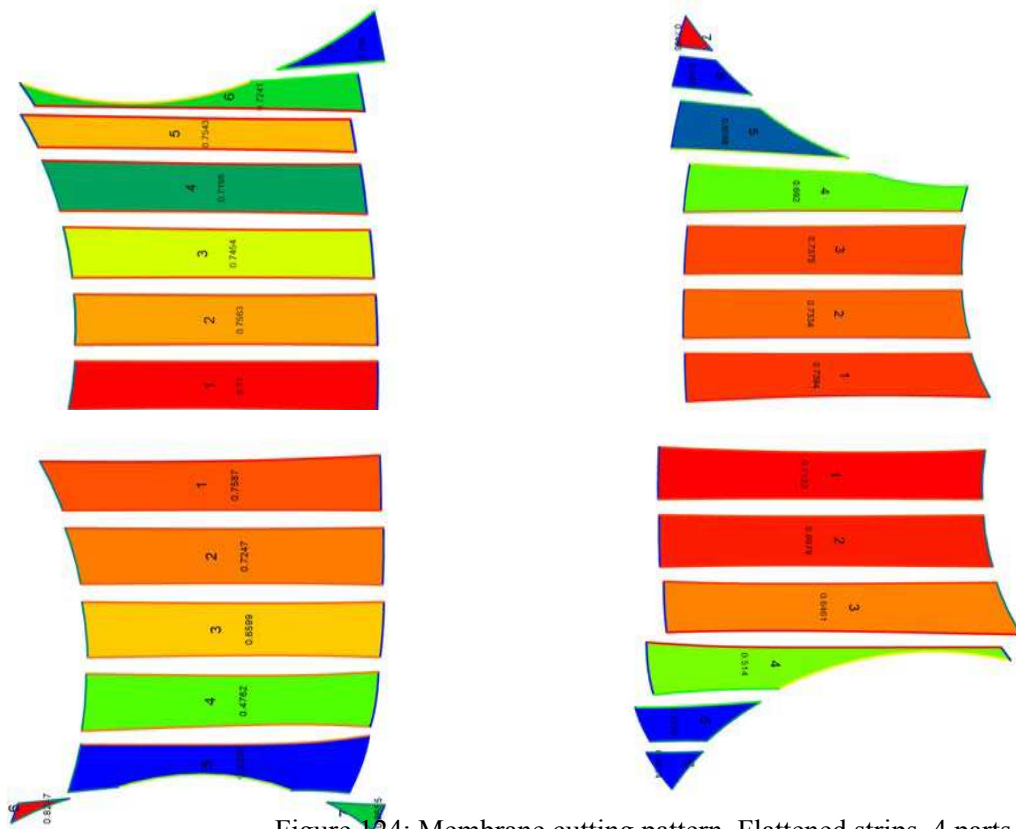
Membrane cutting pattern, Flattened strips, 4 parts
